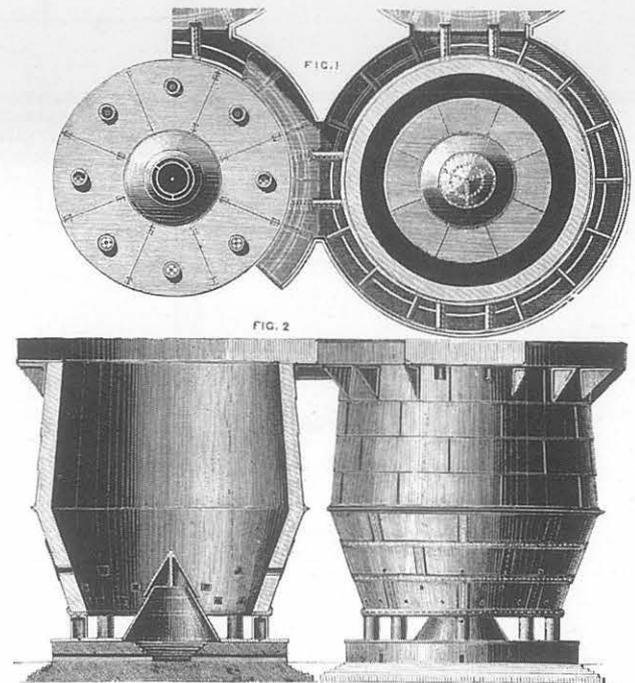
A calcining kiln built at Middlesborough in the 1860s, of a type later erected at Blists Hill. It is constructed of bricks on a cast-iron base plate bolted to the ground and clad in iron sheets. At Blists Hill, the bolts and their associated access pit have survived. (From Frederick Kohn's *Iron and Steel Manufacture*, 1869)
